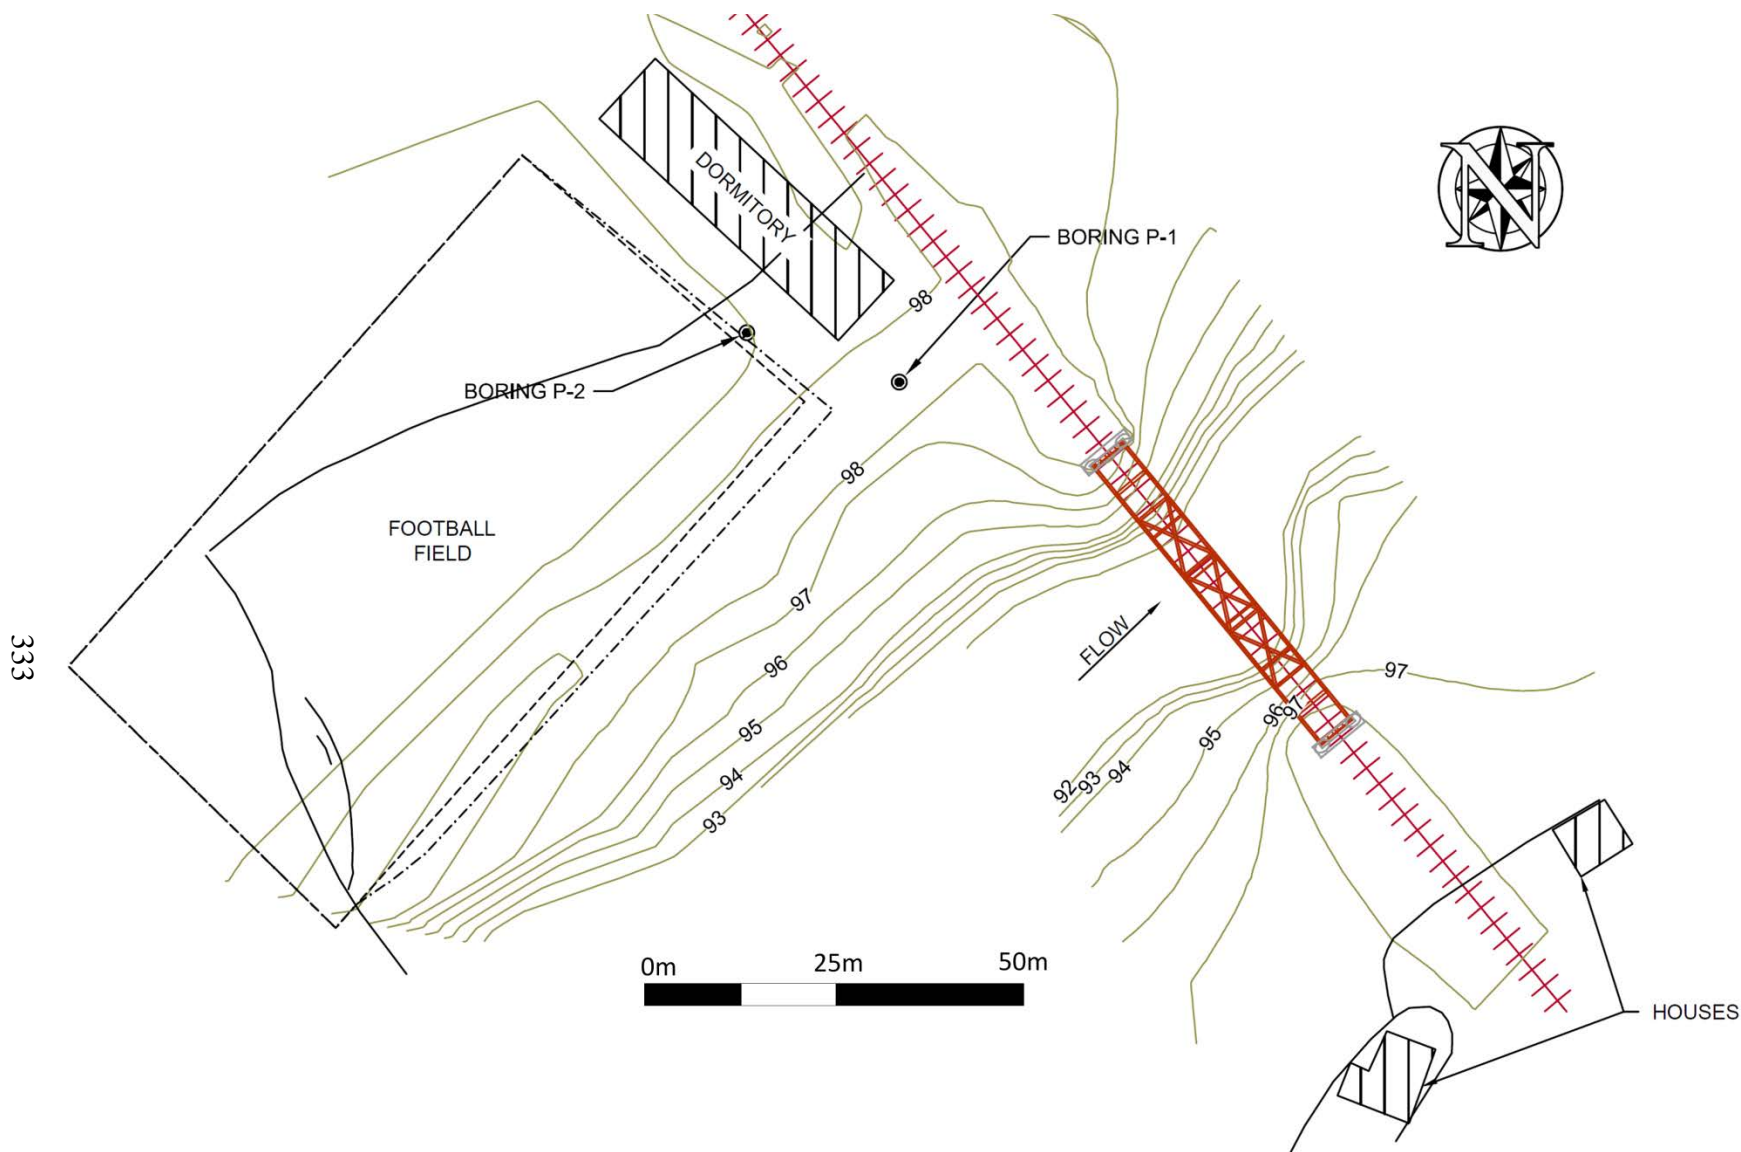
Contour Sketch of the Rio Bananito Railway Bridge
